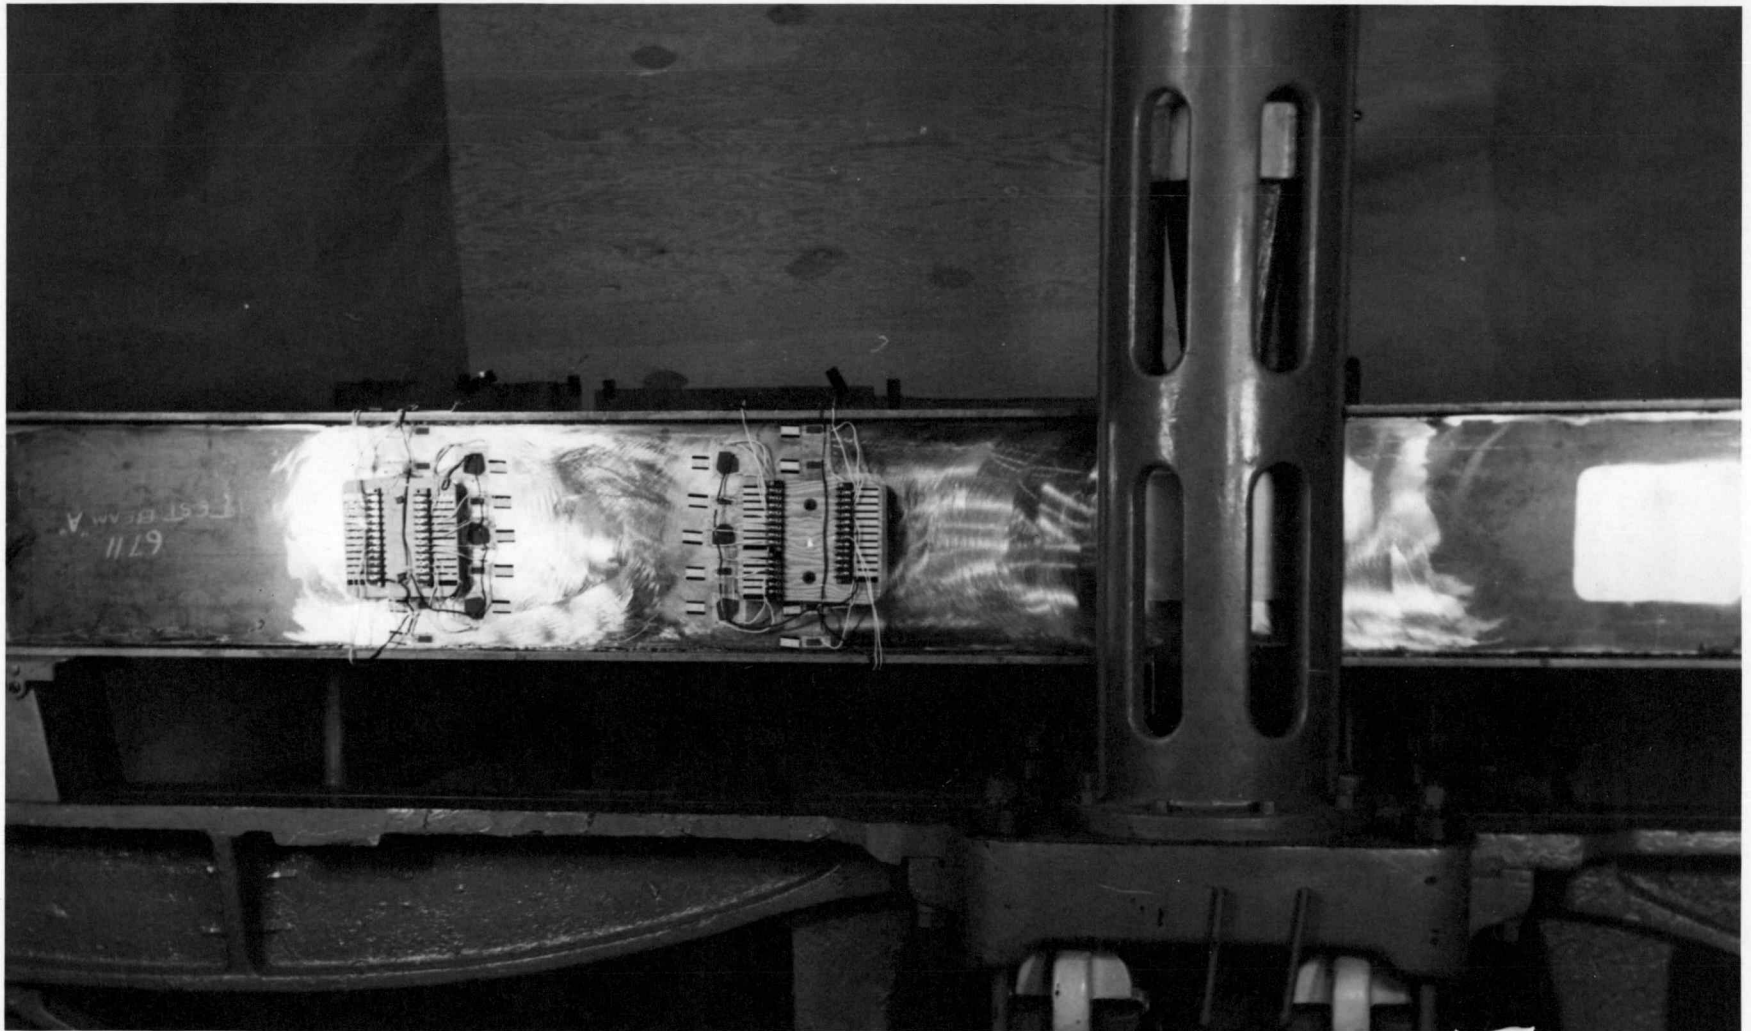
Solid-web I-beam in position in Rhieie Testing Machine.
